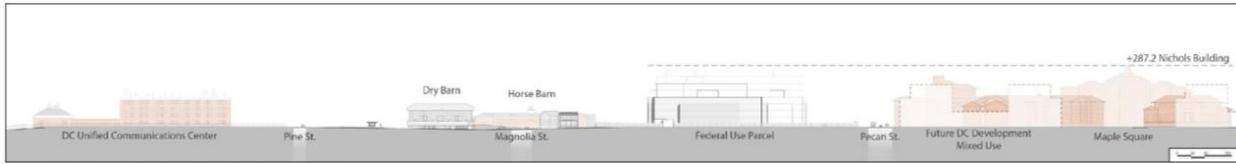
Elevation Study 1 – View East Along MLK Avenue
